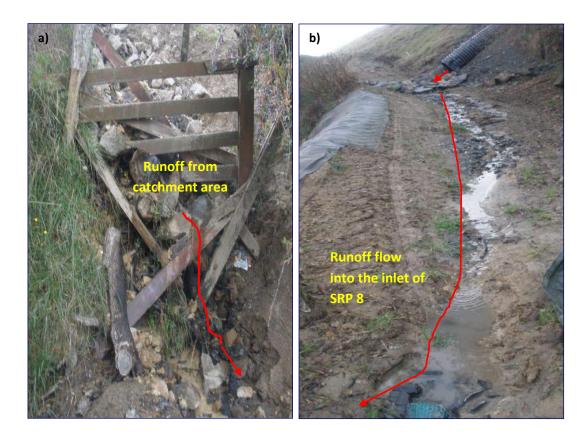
Inflow to sediment retention pond 8; a) The flow channel prior to piping system installation; b) Pipe that conducted stormwater runoff to the inlet of sediment retention pond 8.
